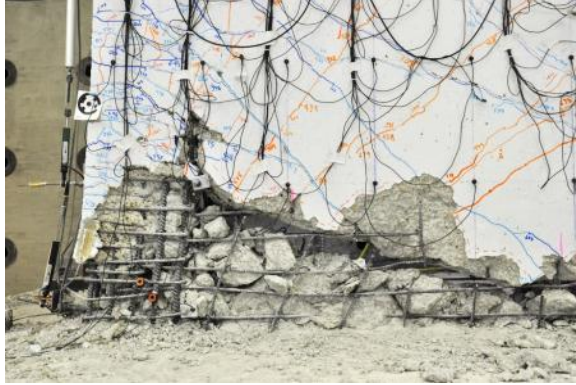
East flange damage attributed to out-of-plane shear demand
